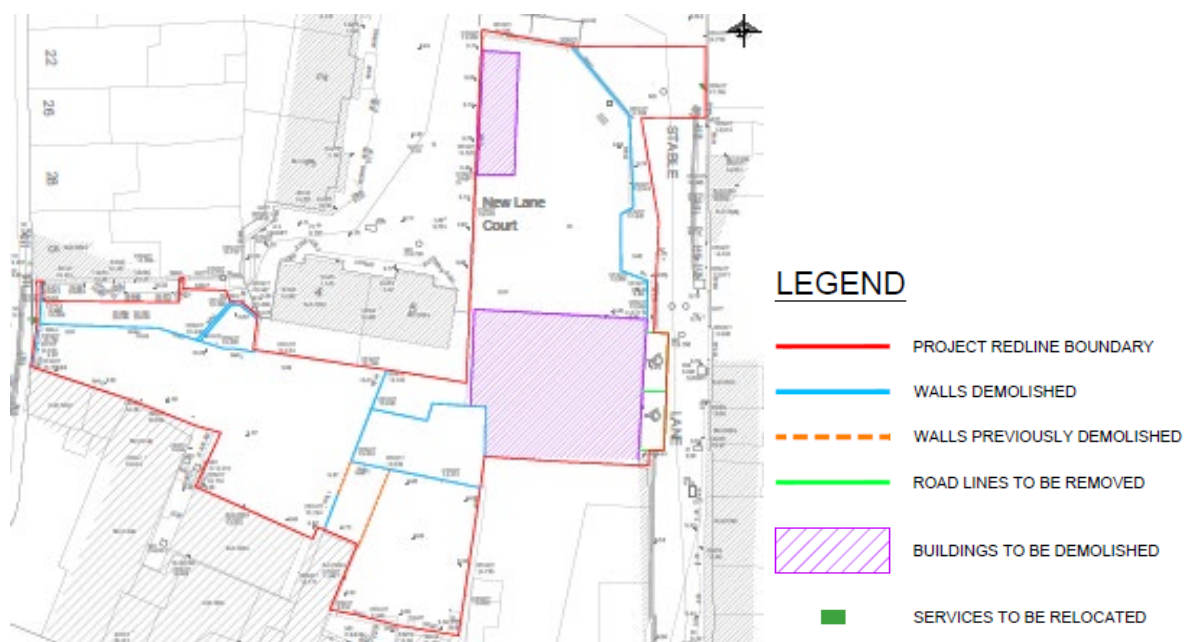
Proposed demolition drawing (site boundary in red, walls to be demolished in pink) - MWP
